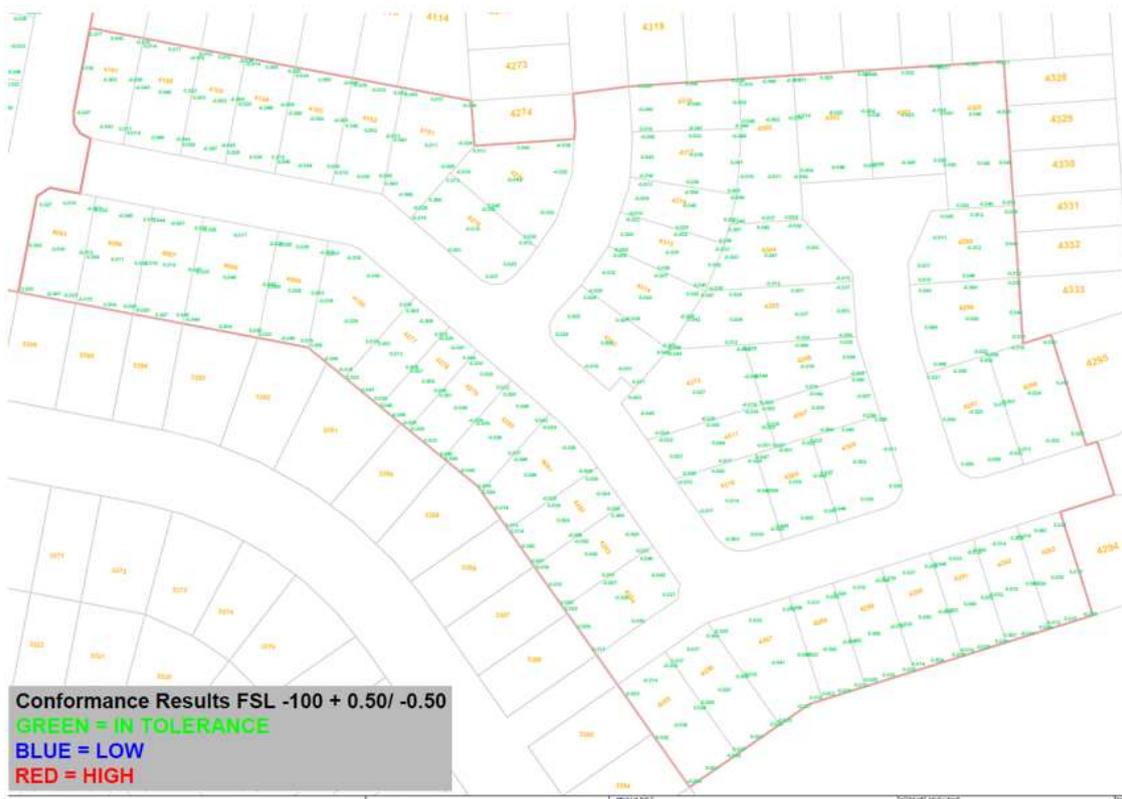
Actual Constructed Area of Fill (100mm BFSL) – Shadforth Survey Plans
